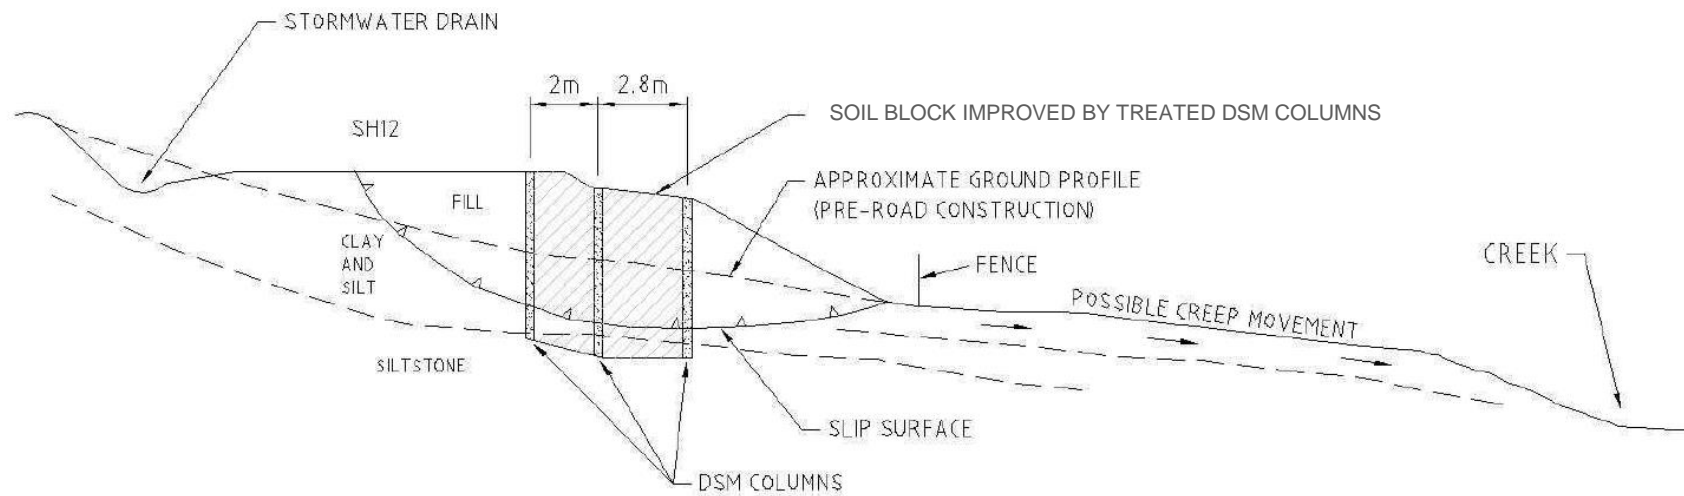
DSM columns used in road slip stabilization in Northland, New Zealand (Terzaghi et al., 2004)
